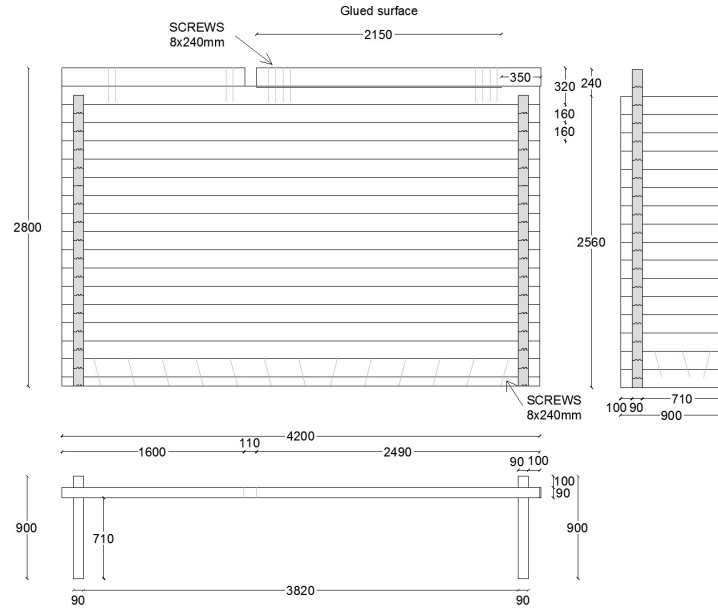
Dimension of M/C_ST_90 wall specimen.
